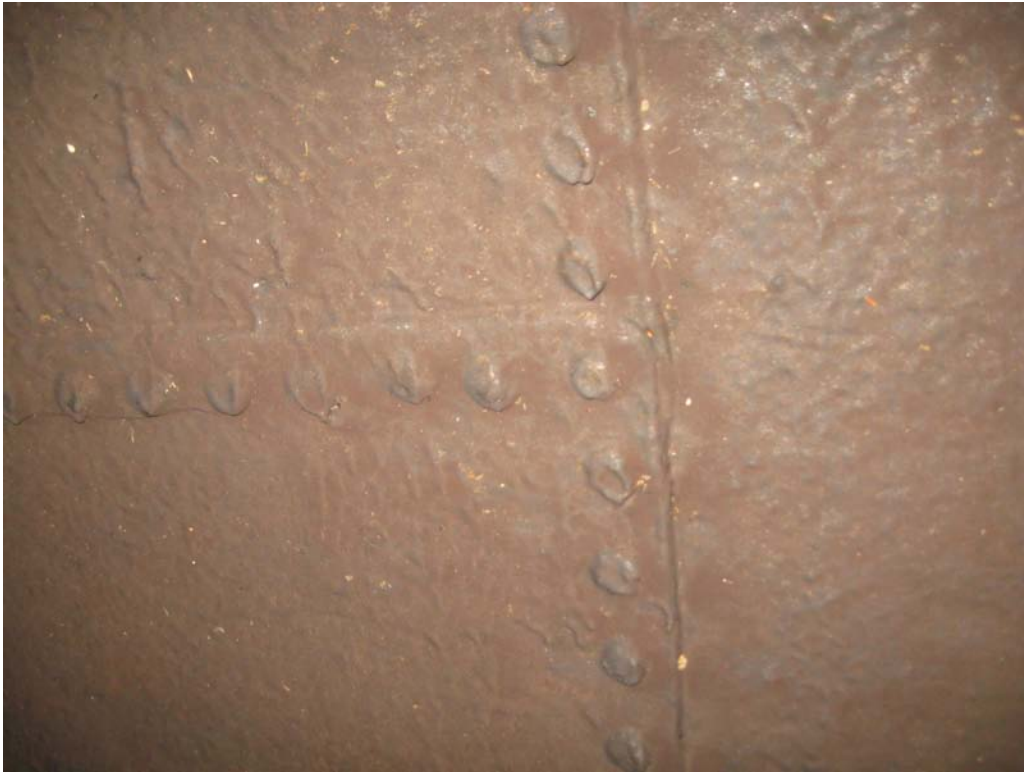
PENSTOCK NO. 3 COATED RIVET JOINTS (2)
